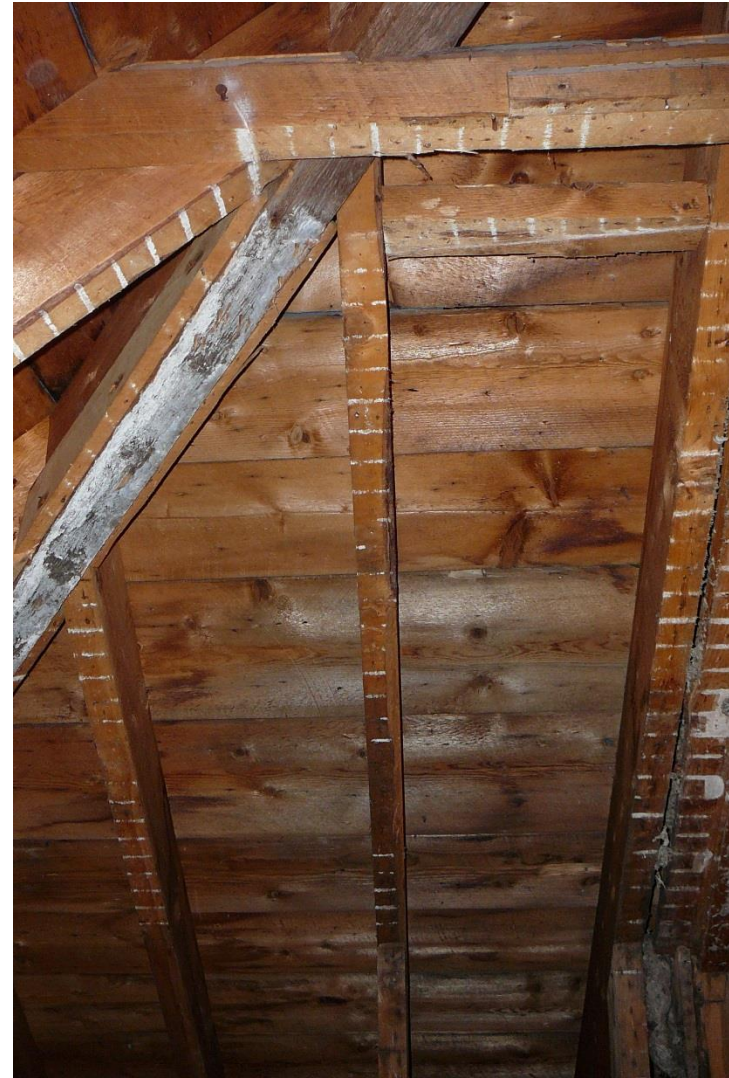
Attic floor roof structure, north rooms (A2/3), view up (Quinn 2017).
